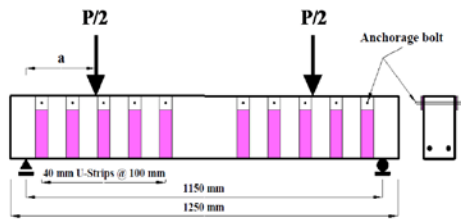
Shear Strengthening with End Anchoring B2 and B5<sup>(21)</sup>
